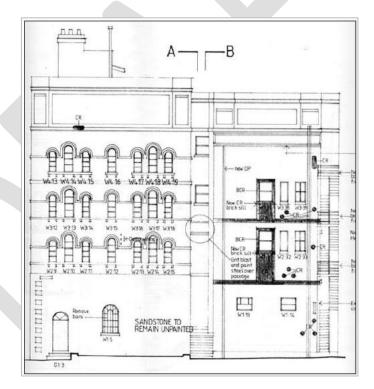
The eastern façade of the building showing the proposed cement render repairs which included repair to the infilled former door openings on the eastern wall of the northern, 1920s wing. Note the steel stair at right. (Source: SHFA File, No RE 1352.01.01, Drawing No. CP3/27)
